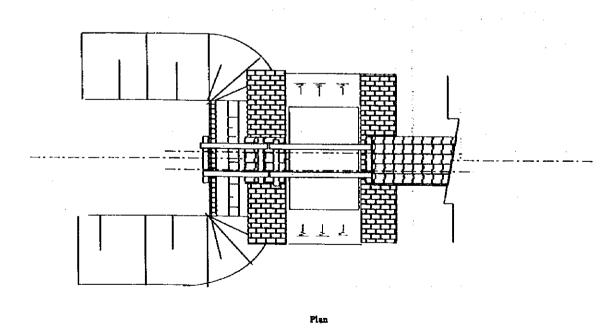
Temporary Supports for Construction of Bridge Structure
